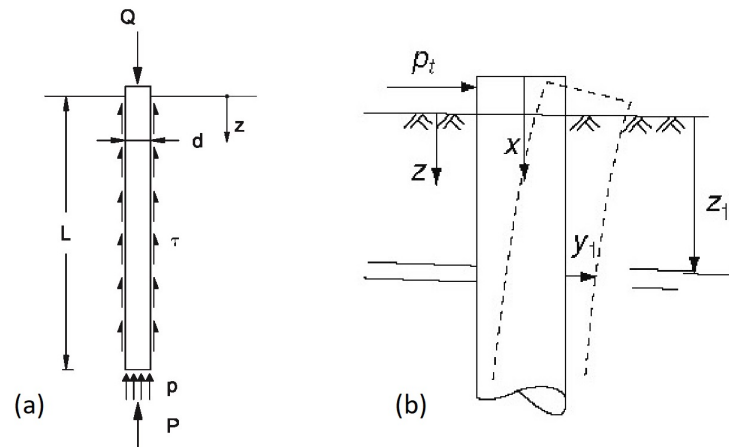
(a) Vertical loading [2] and (b) lateral loading of pile [3]
